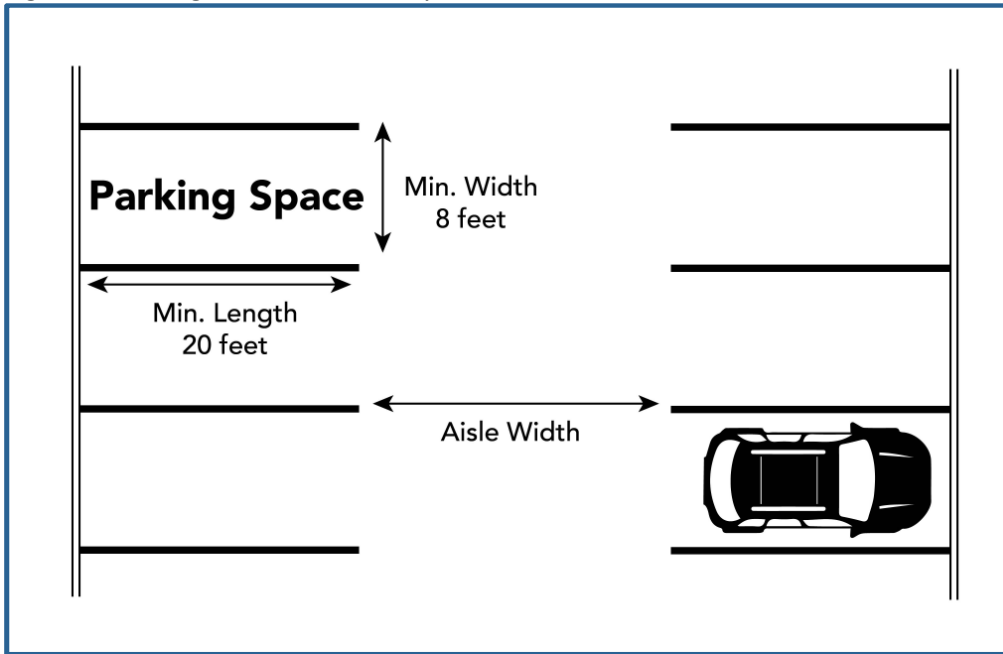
Parking Stall and Aisle Way Dimensions, 90°
